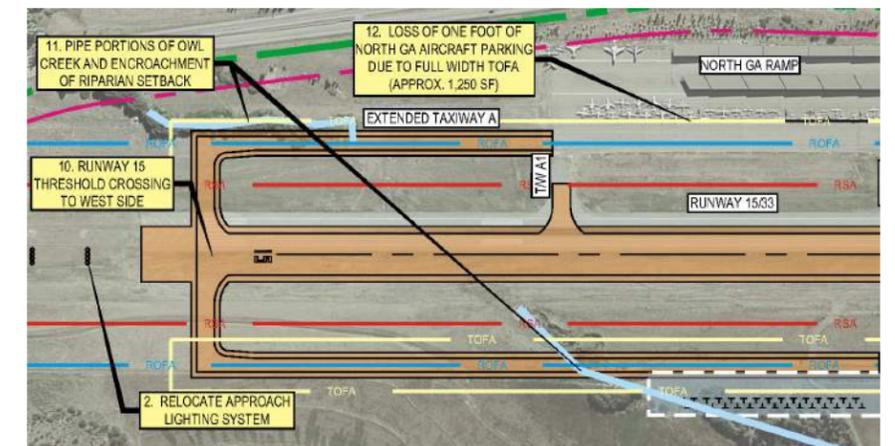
Owl Creek Piping (Appendix D, Alternative 12, Sheet 1 of 23)
